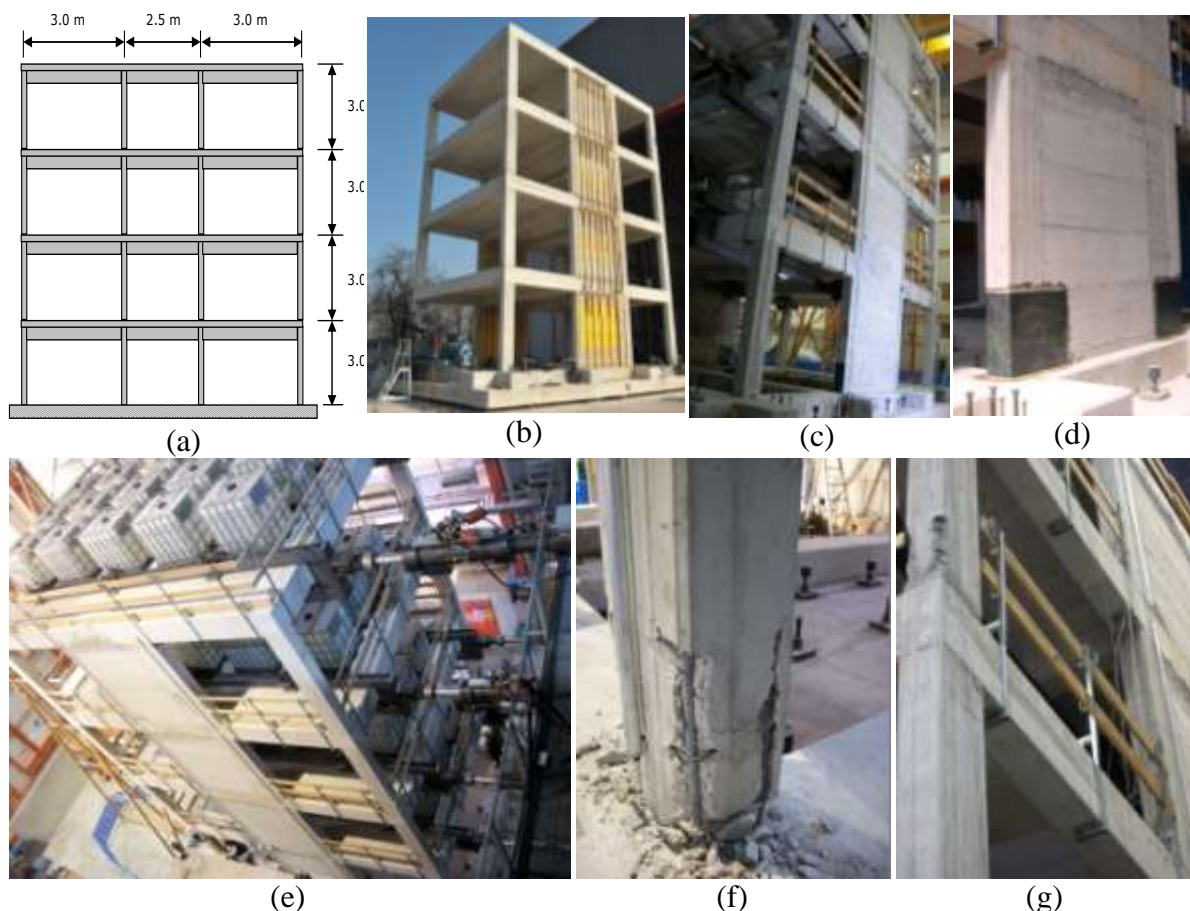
(a) overall RC frame dimensions; (b) RC-infilling of central bay; (c) completed structure; (d) FRP-jacketing of column-edges at the base of composite wall (e) PsD testing at ELSA Reaction Wall; (f) damaged base of ground floor column; (g) damage at the base of a 3rd storey column.
